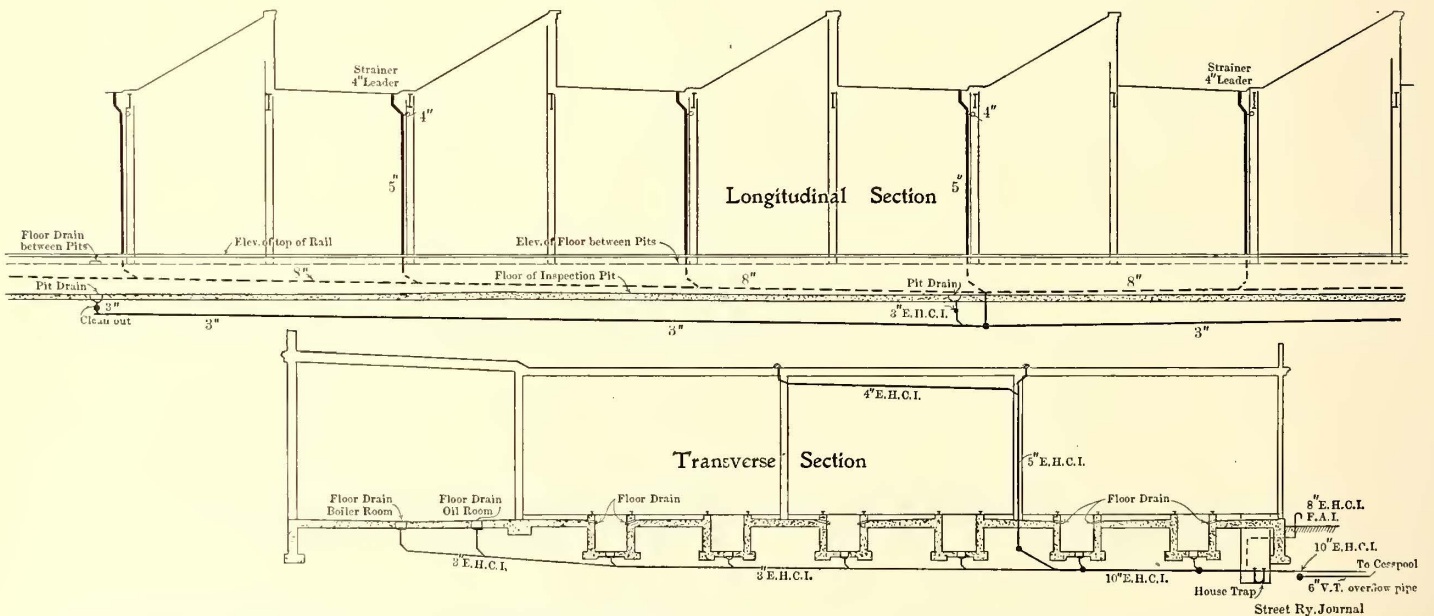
LONGITUDINAL AND TRANSVERSE SECTIONS, SHOWING THE DRAINAGE SCHEME AT THE LUTHERAN INSPECTION PLANT
